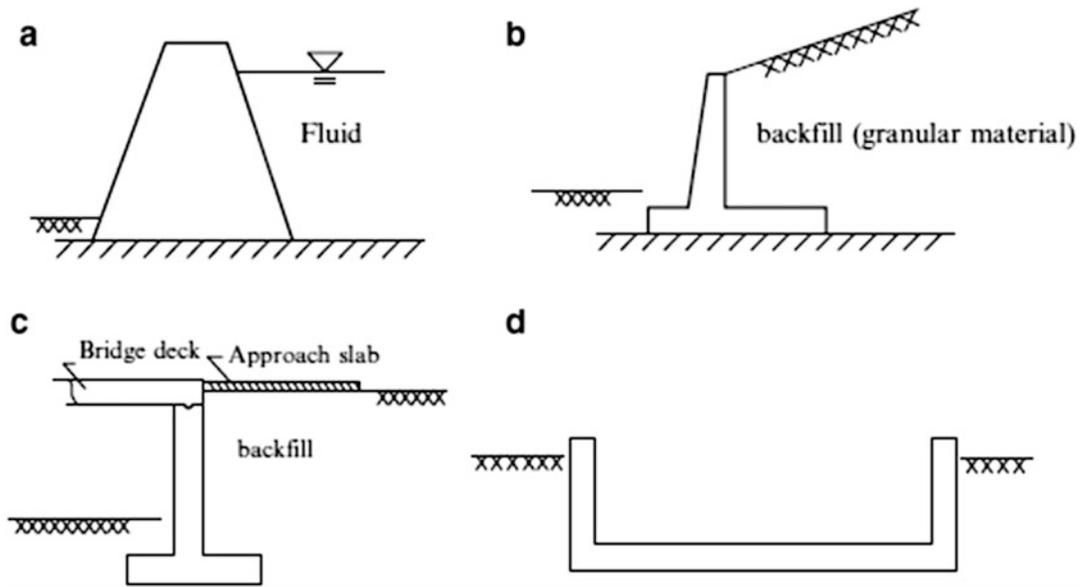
Vertical retaining wall structures. (a) Gravity dam. (b) Cantilever retaining wall. (c) Bridge abutment. (d) Underground basement
